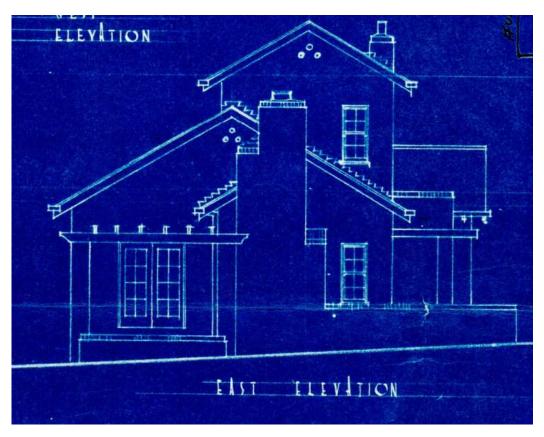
East elevation (front façade) as depicted in the 1940 building permit plans. Note the existence of the first floor, as well as an open pergola (lower left) where the sunroom is today. (Source: BP No. 12784, 1940)
